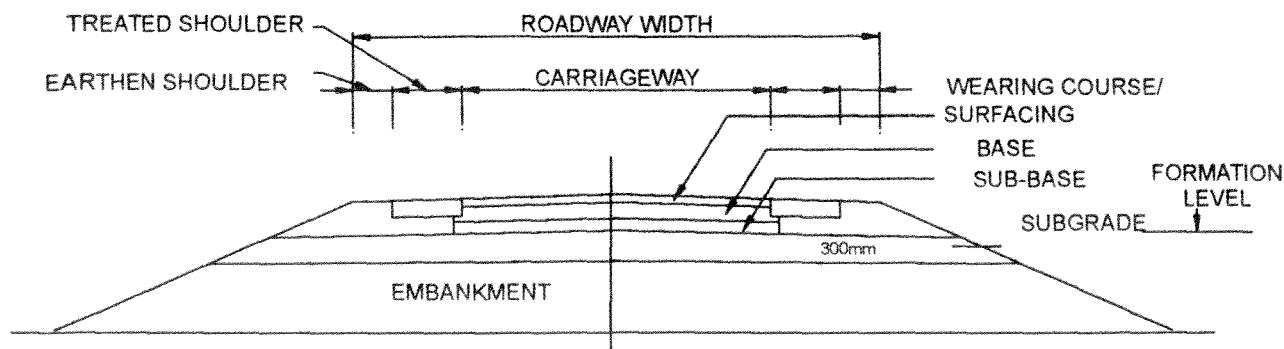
Terms Used in the Specifications to Describe Road Cross-Section Elements with a Flexible Pavement
